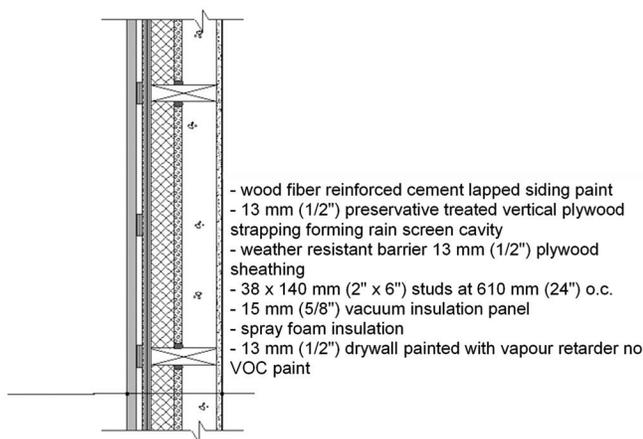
Plan section through the Harmony House above-grade exterior wall assembly.
